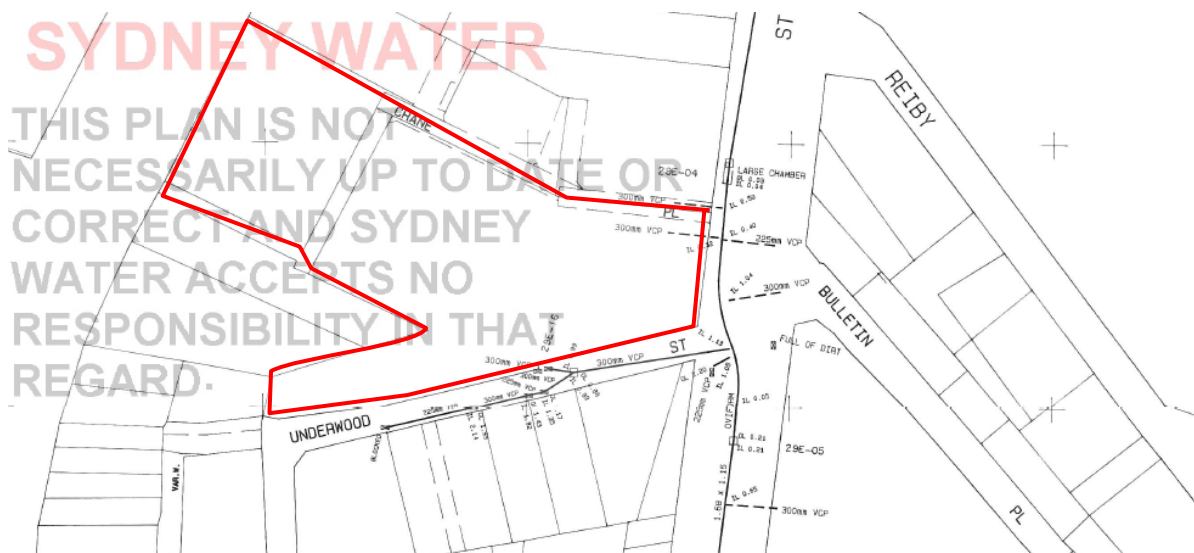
Sydney Water plan showing the Tank Stream oviform drain, and a secondary drain from Underwood Street running into the Tank Stream drain in Pitt Street. No. 33-35 Pitt Street is immediately to the west.
